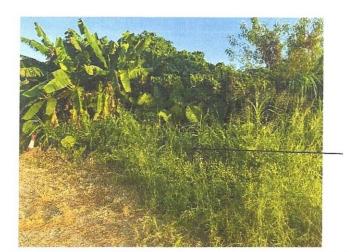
As indicated in the drainage layout plan there will be a proposed 225mm U-channel and two desilting pits to collect the stormwater that induced in the lots.
